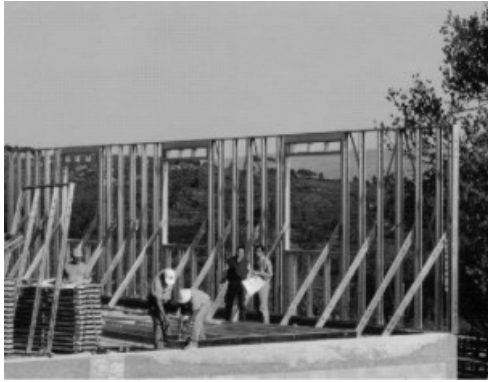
Structural elements of a light gauge steel framing exterior wall.
